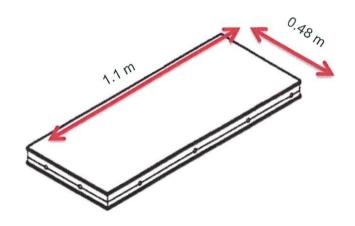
Deck Panel Source: architectjaved.com (n.d)
